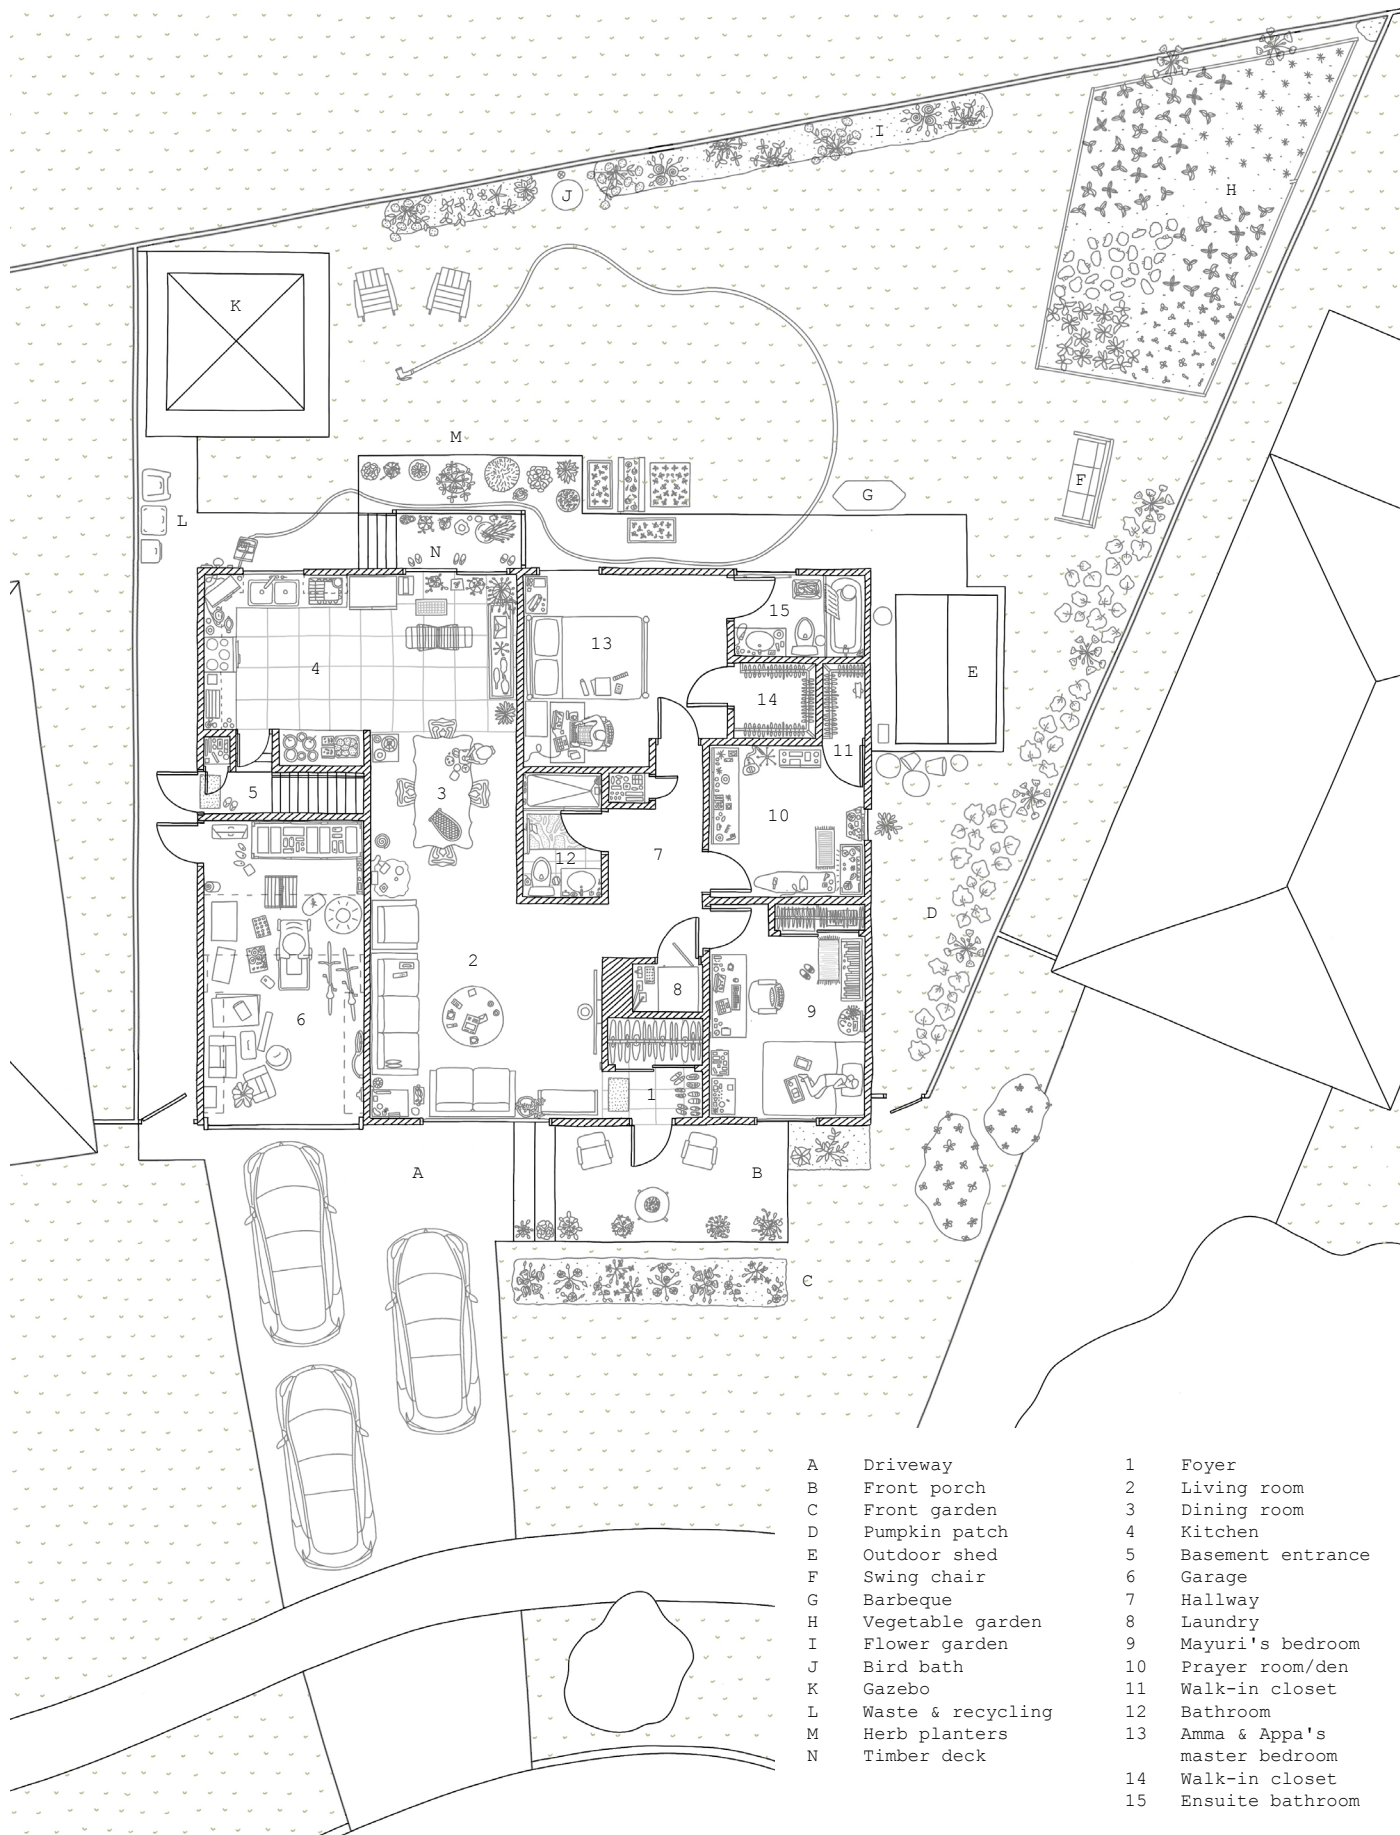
Site plan drawing of the Scarborough home showing ground floor conditions.
